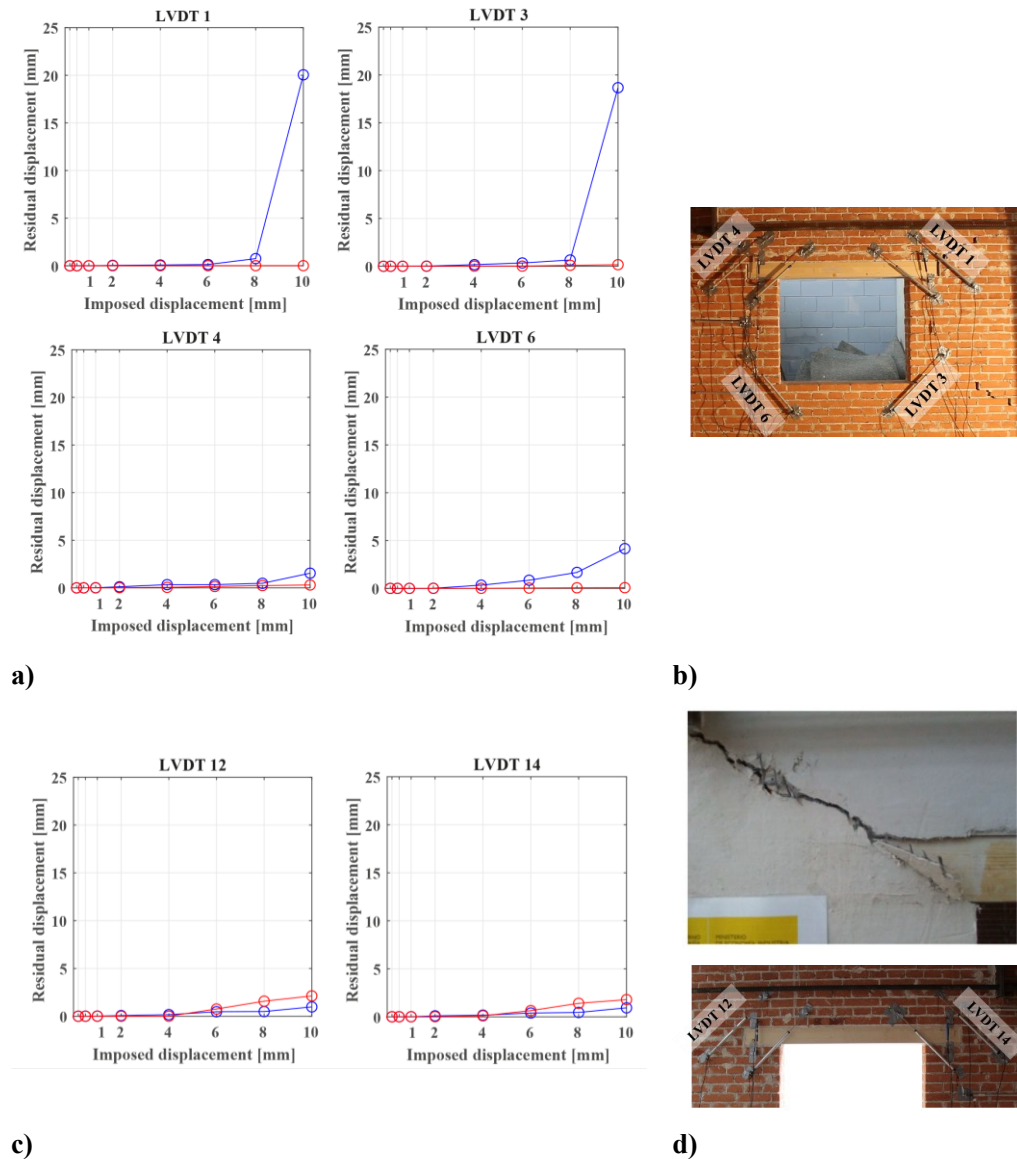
Residual displacements read by LVDT 1-3-4-6-12 and 14 (a), the crack pattern of the URM structure in the windowed wall (b), and of the TRM strengthened masonry in the door wall (c).
